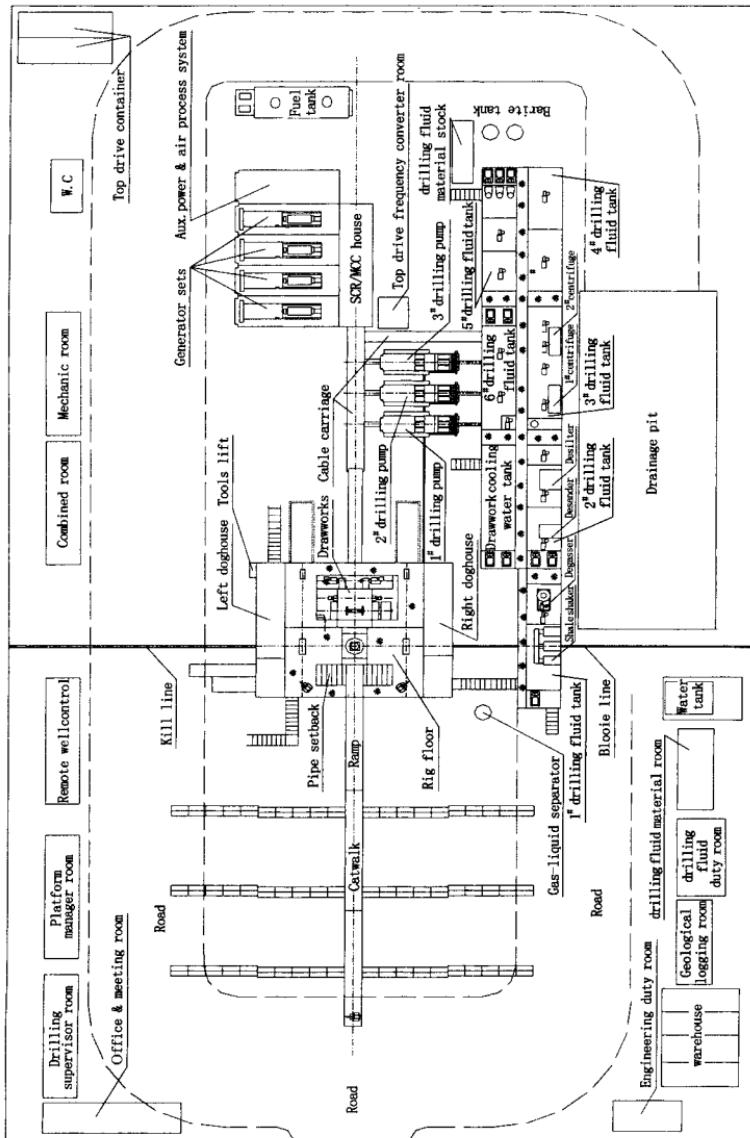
Plane layout for Electrical Rig ZJ70D, ZJ70DB
